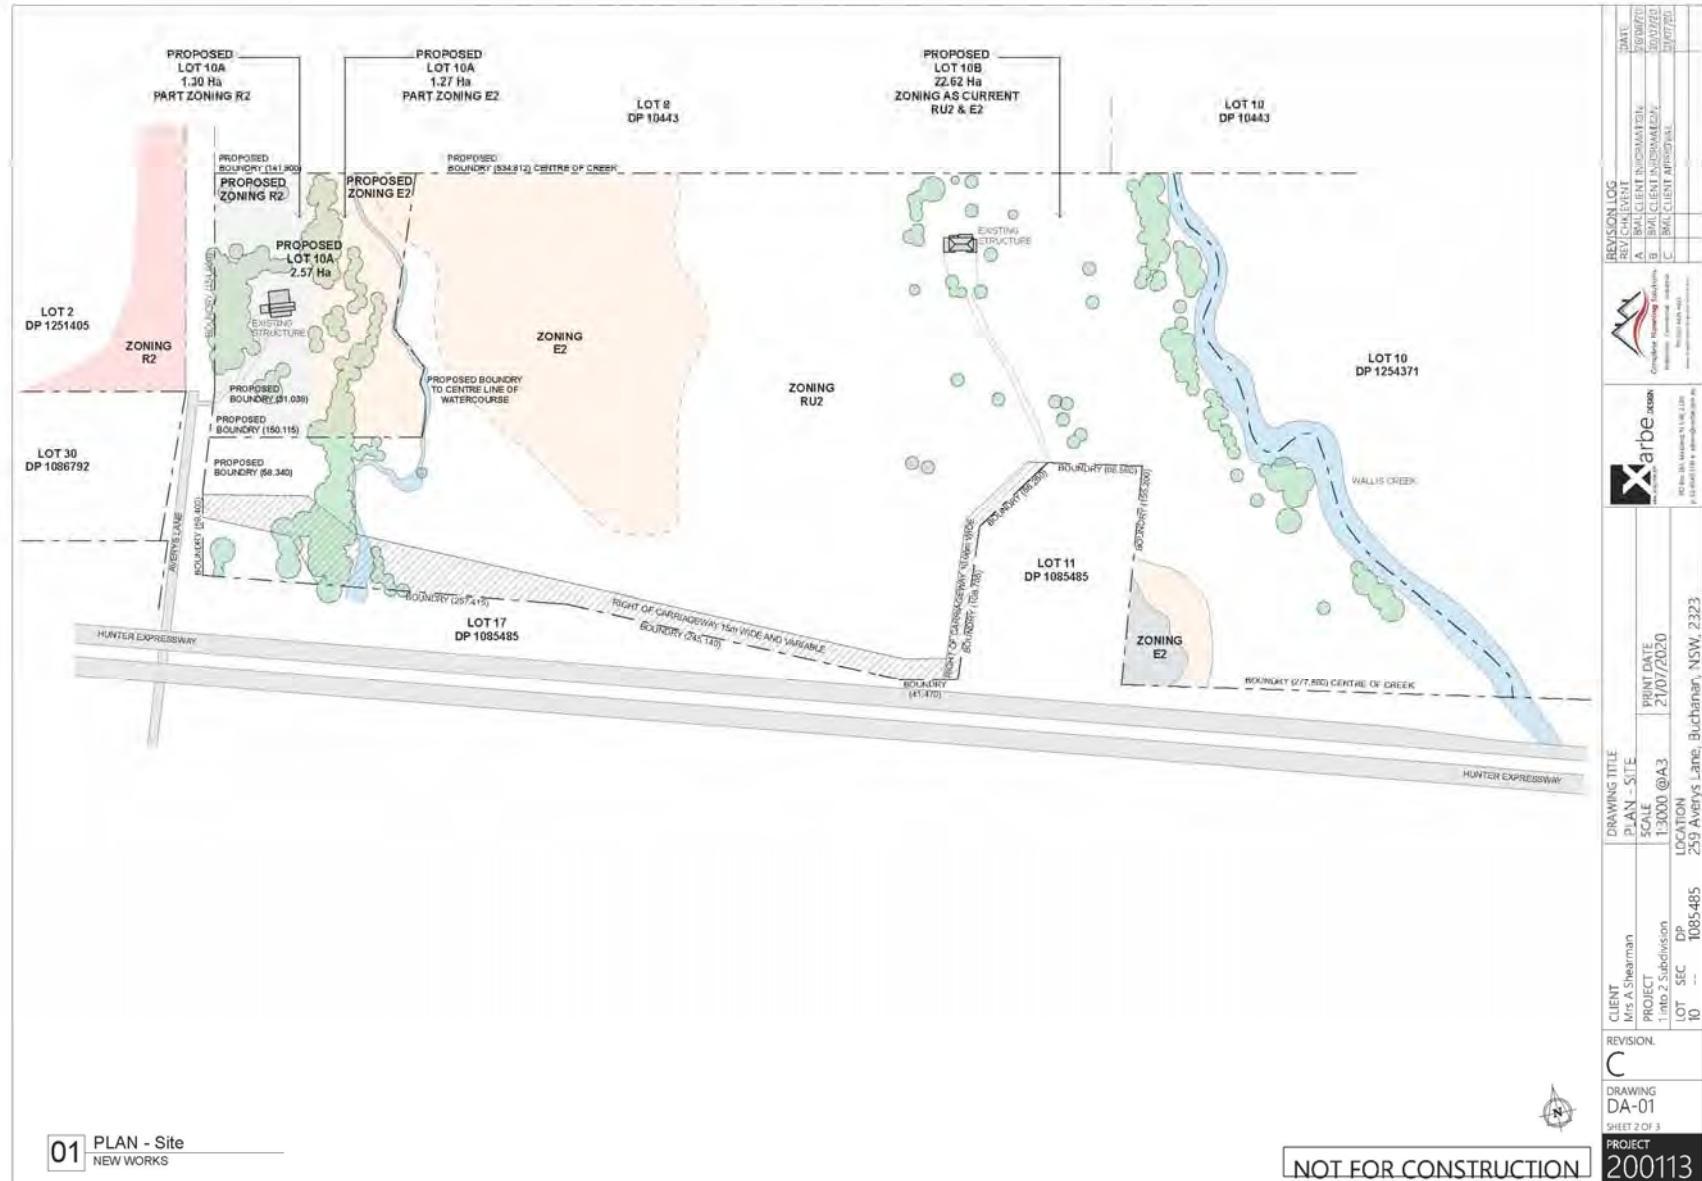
Site plan (from Complete Planning Solutions, dated vC dated 25.09.20)
